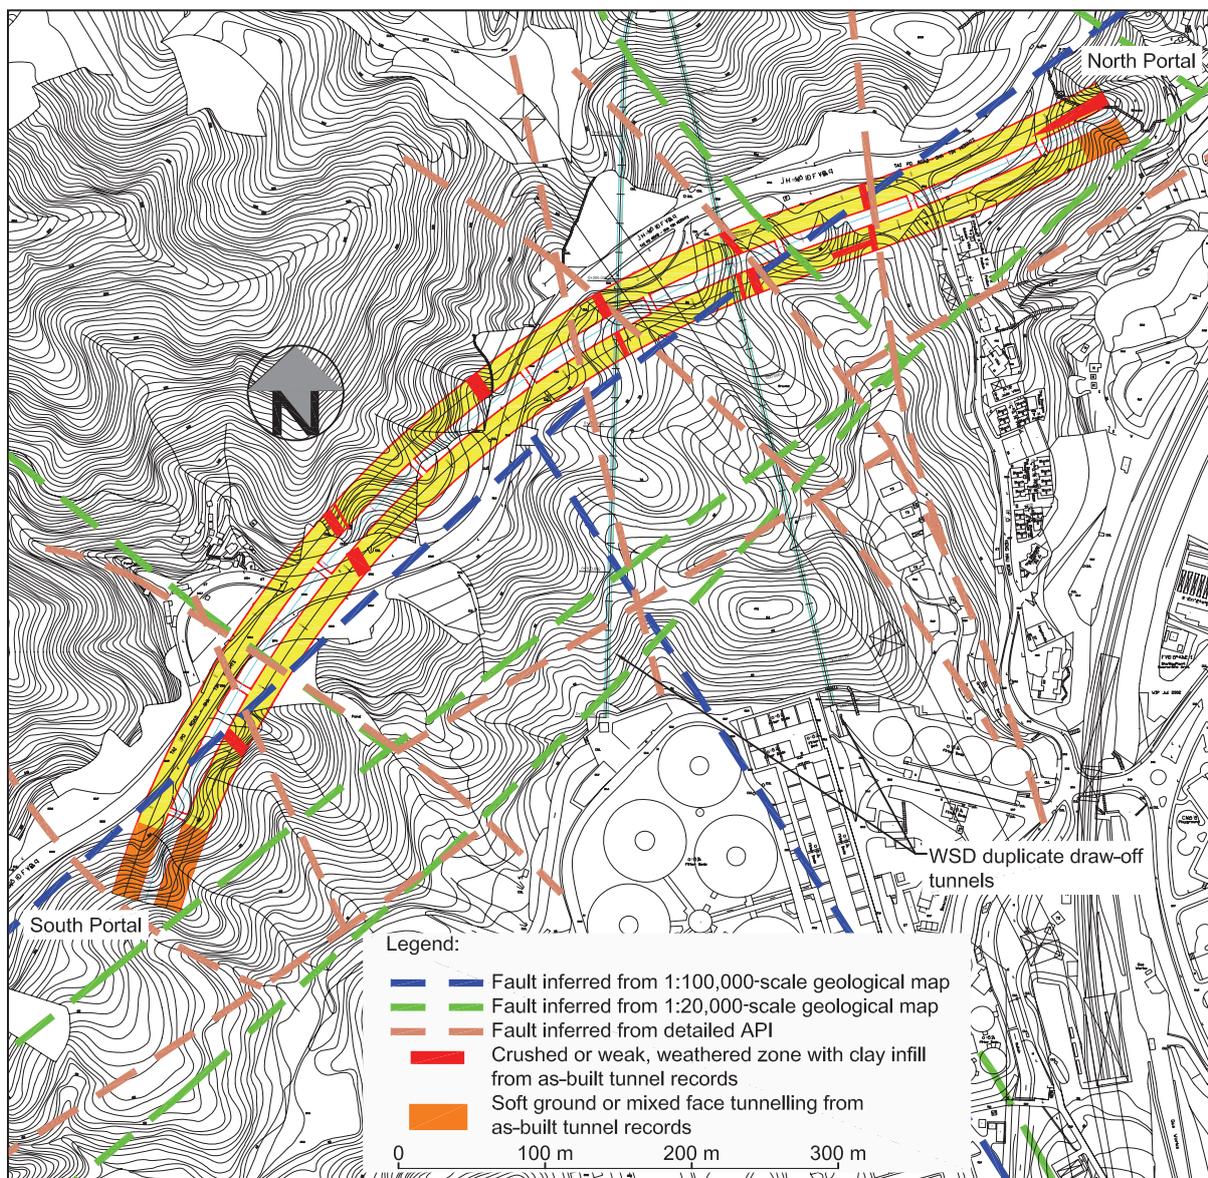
Layout plan of geological structures encountered in the Sha Tin Heights tunnel and faults and photolineaments inferred from detailed API and the 1:20,000-scale (GCO, 1986a) and 1:100,000-scale (Sewell *et al.*, 2000) published geological maps
